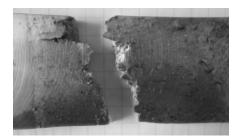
Specimen, lacing bar after testing in tension failure. Photograph by the author.
